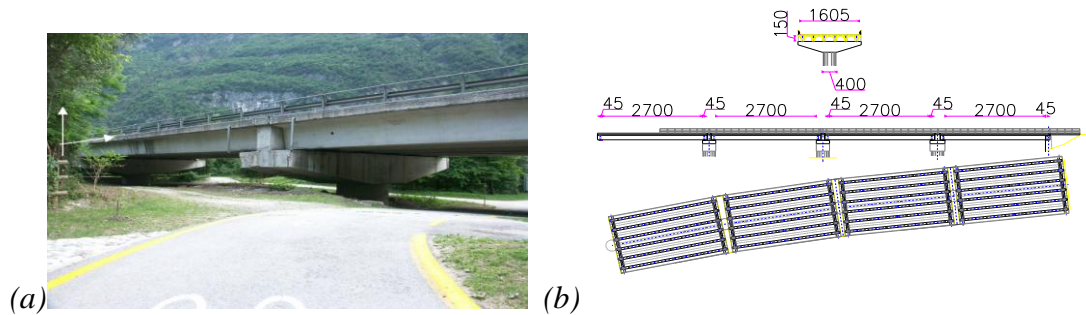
Viadotto Pianello: (a) overview (b) plan view, elevation and cross-section of deck
